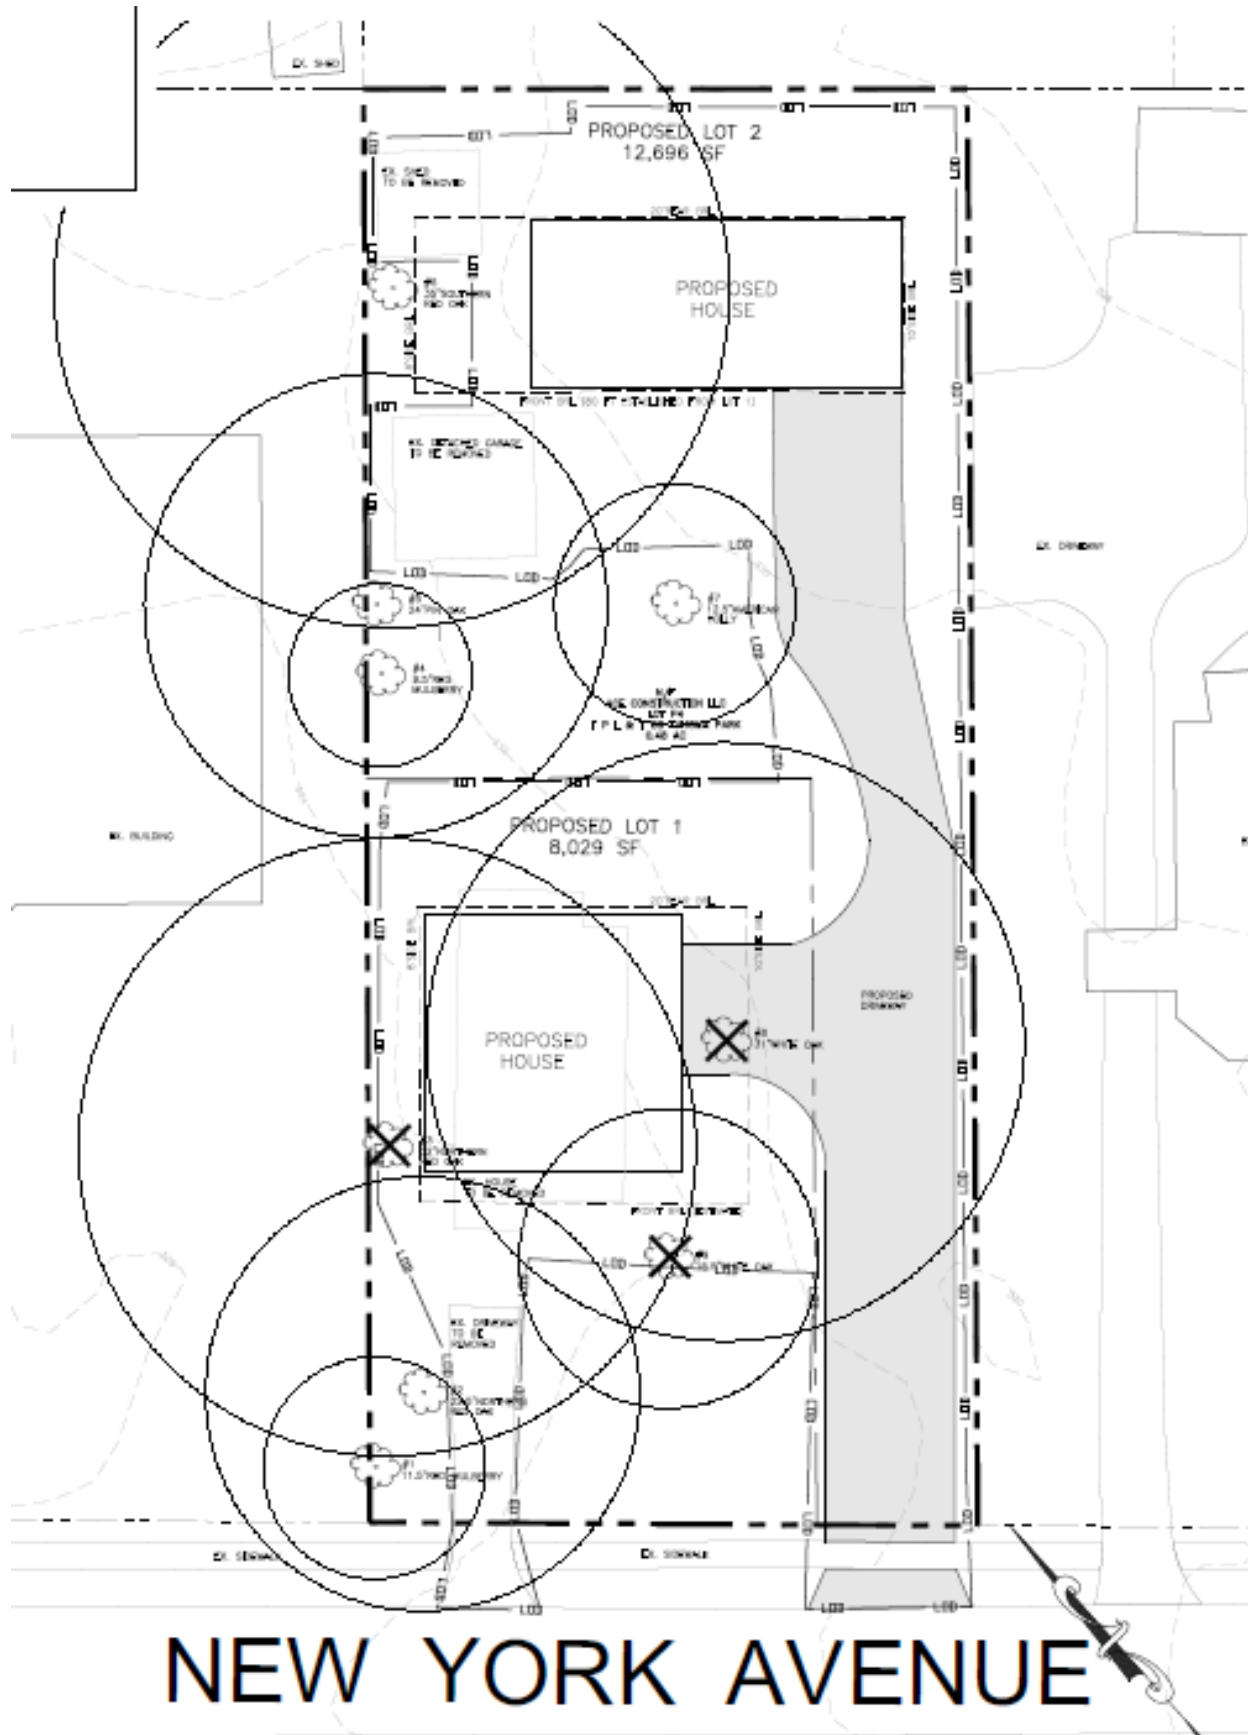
Proposed site plan and tree survey. Trees with black Xs are proposed for removal.
